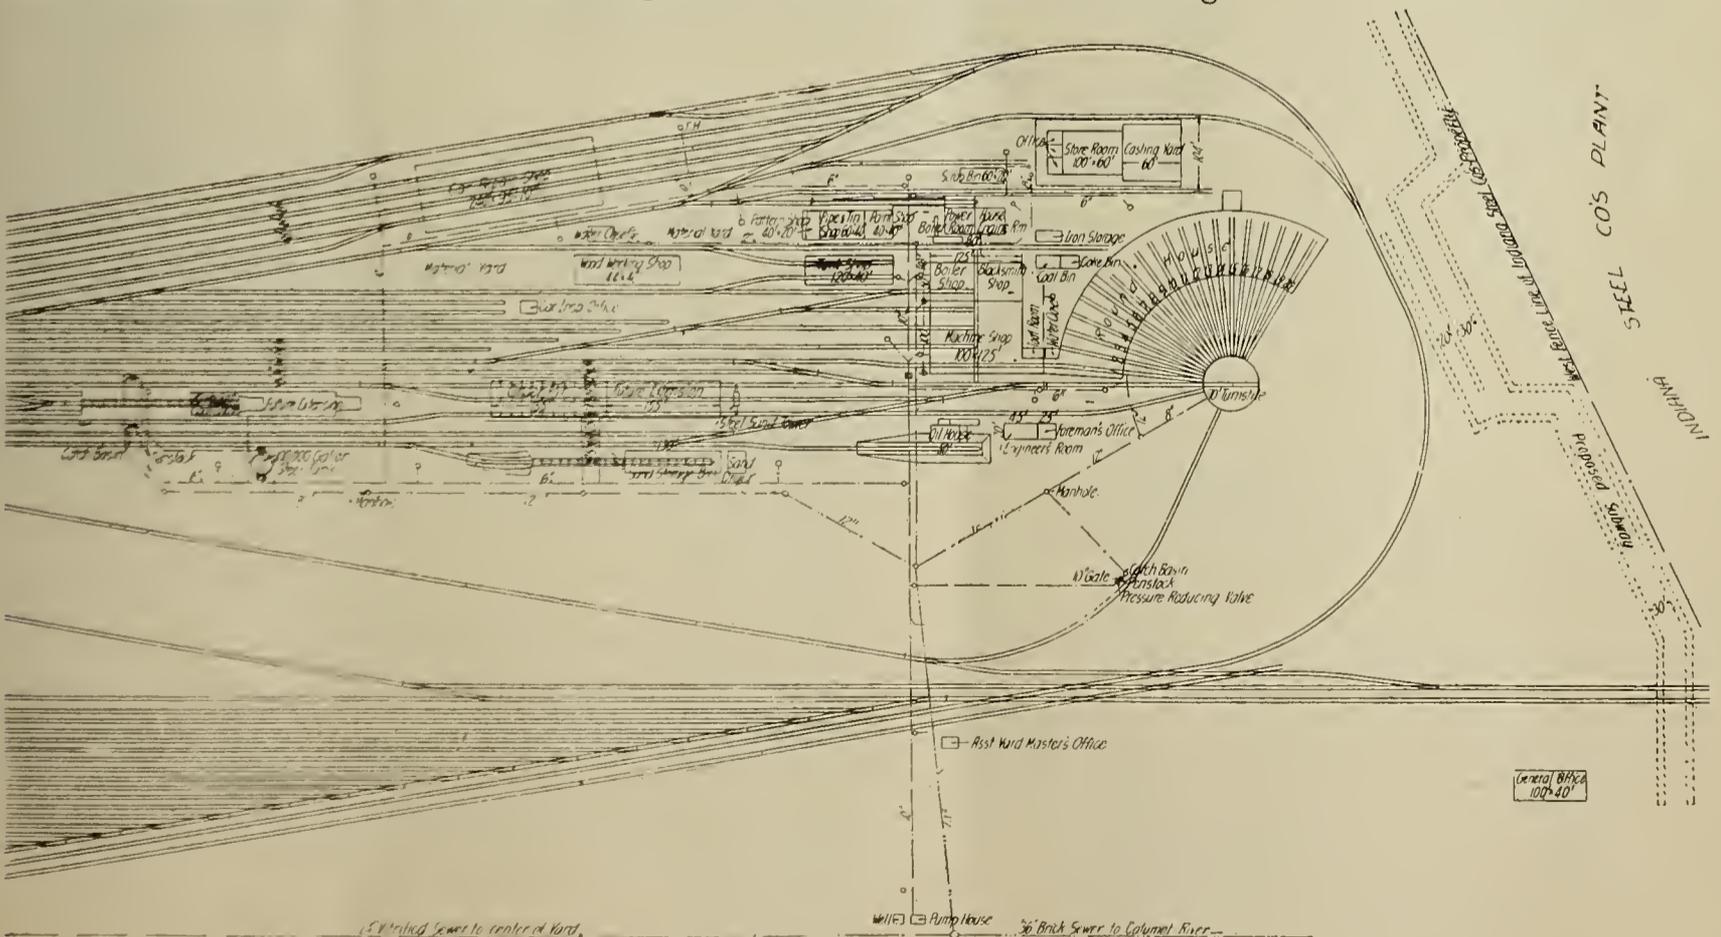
GENERAL LAYOUT OF TERMINAL SHOPS AT GARY, IND.—C., L. S. & E. RY.
